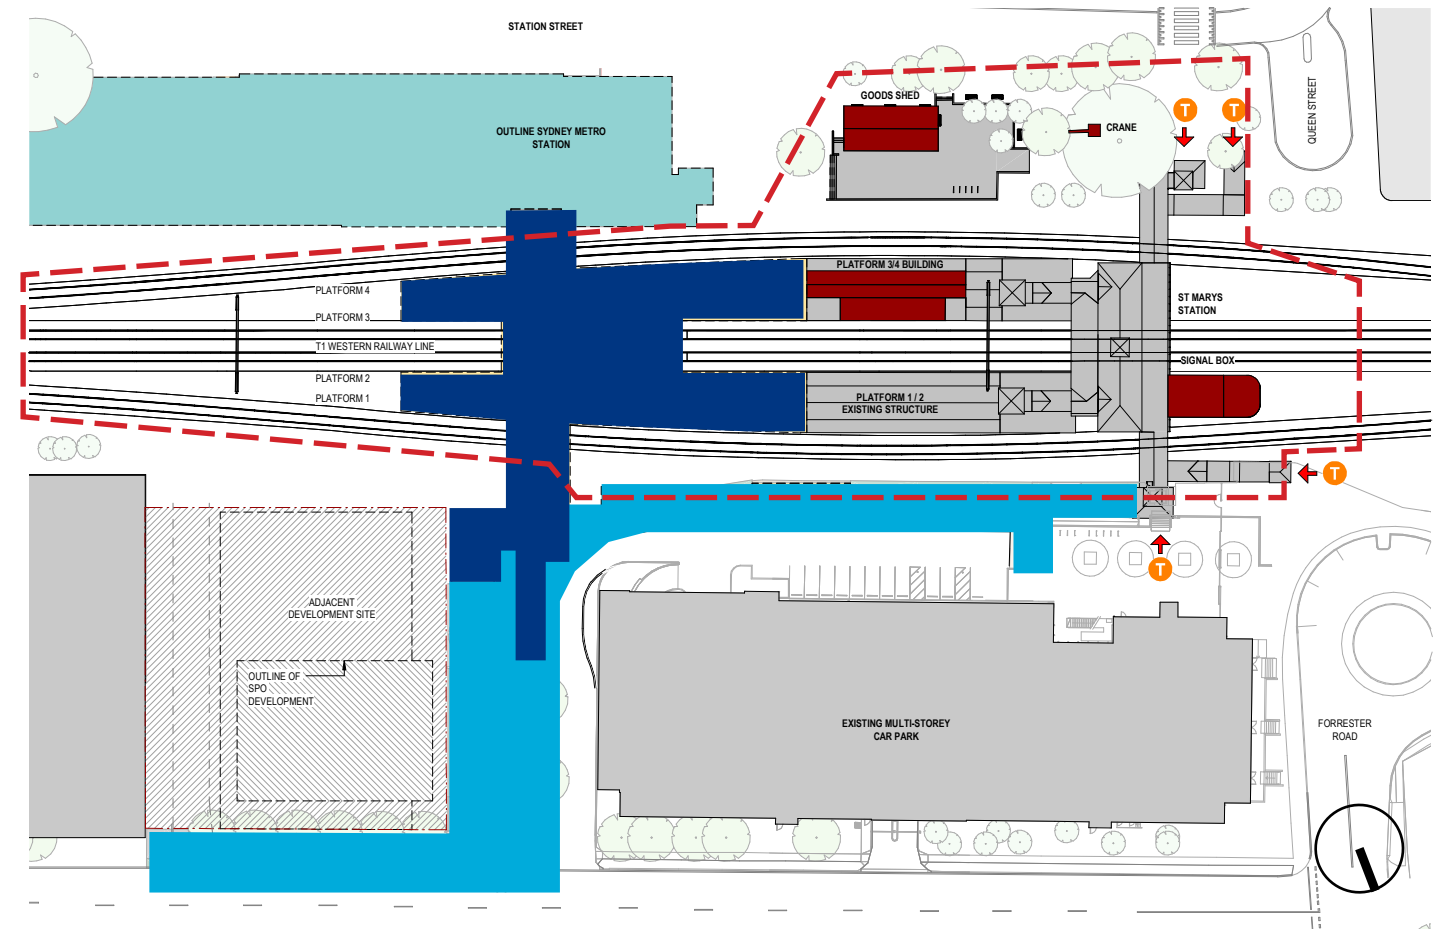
site plan diagram showing heritage elements adjacent St Marys Station footbridge
